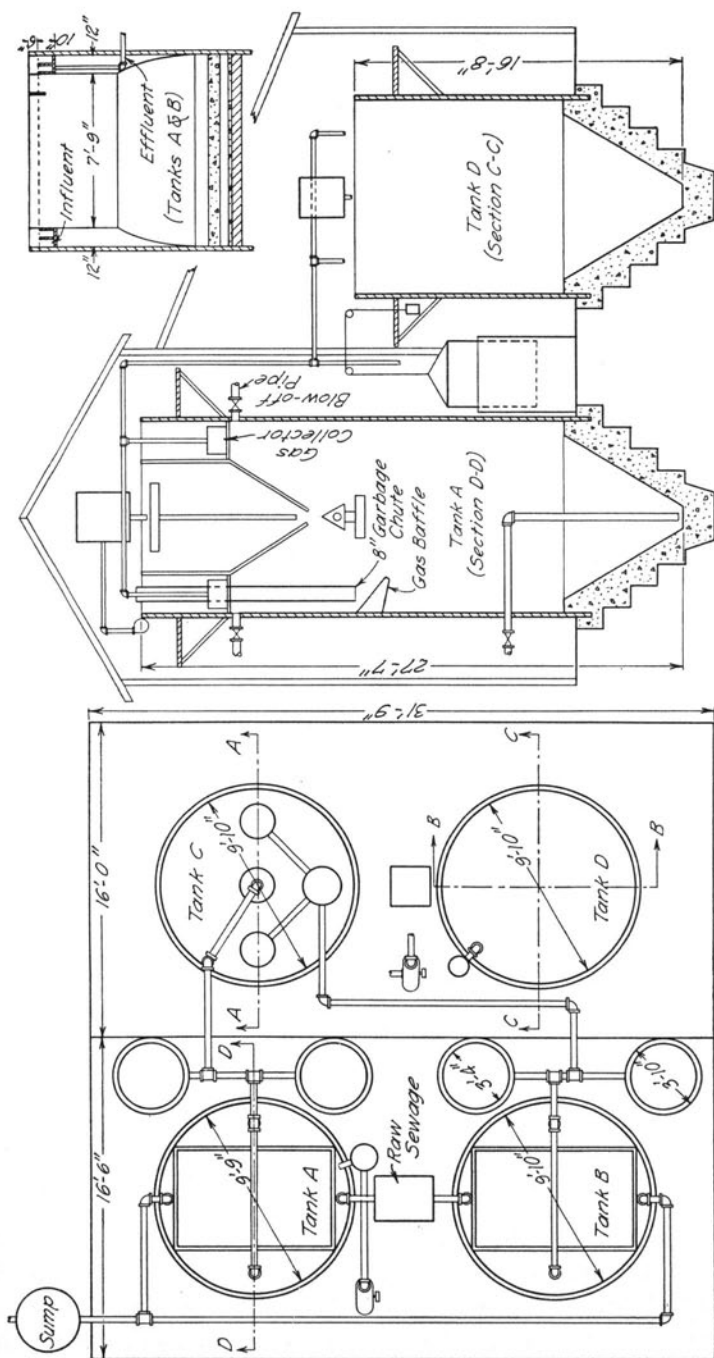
PLAN OF EAST BUILDING SHOWING TANKS A, B, C, AND D
